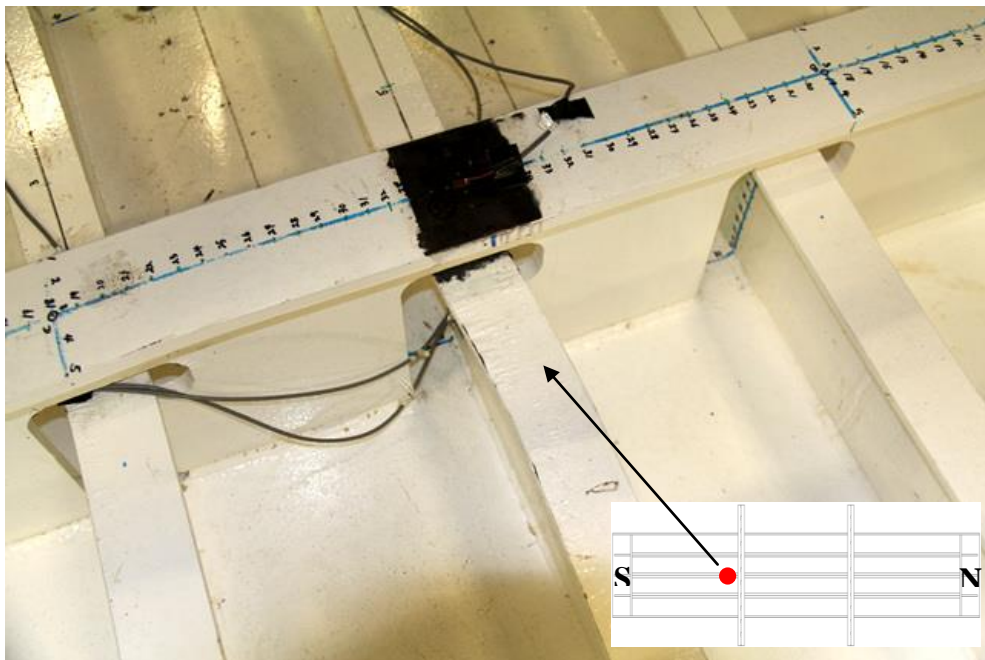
Distortion of longitudinal stiffeners near the stringer
